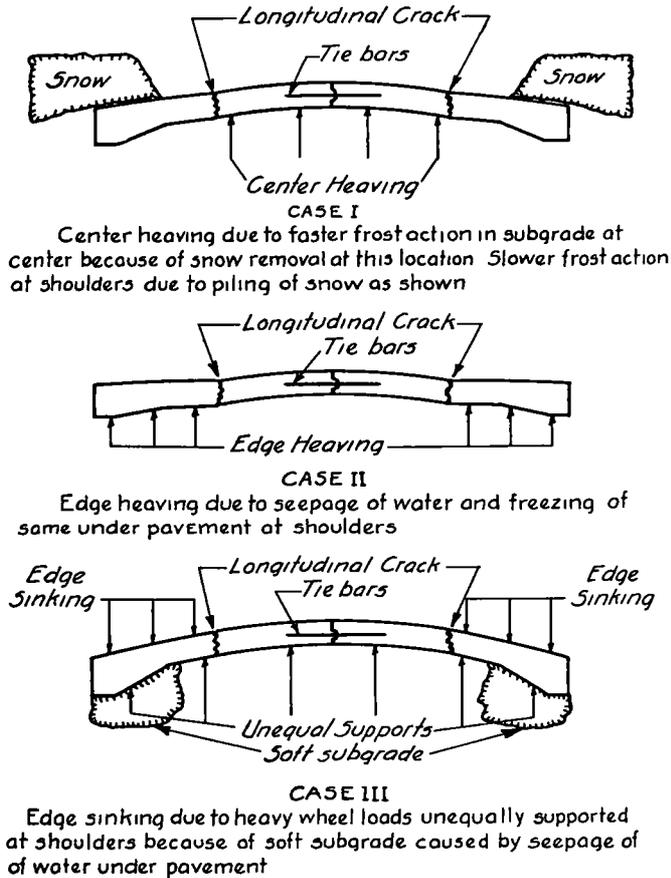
Theory of Longitudinal Cracking of Concrete Pavements
